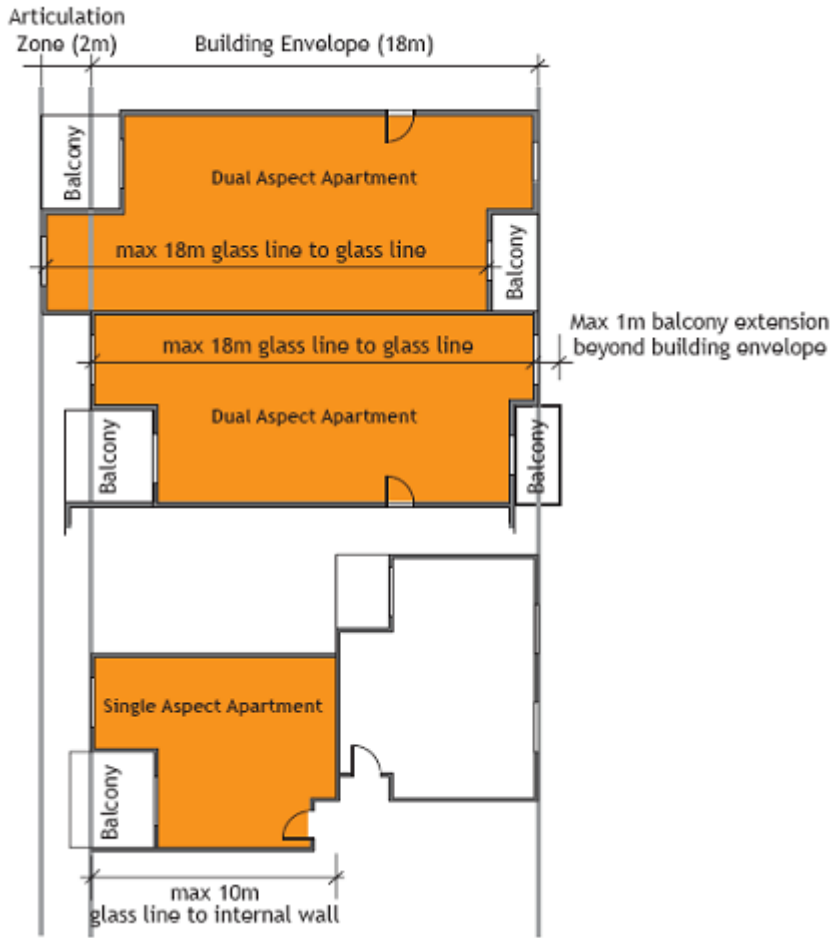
Building Depth - Source: Residential Flat Design Code, Planning NSW 2002
